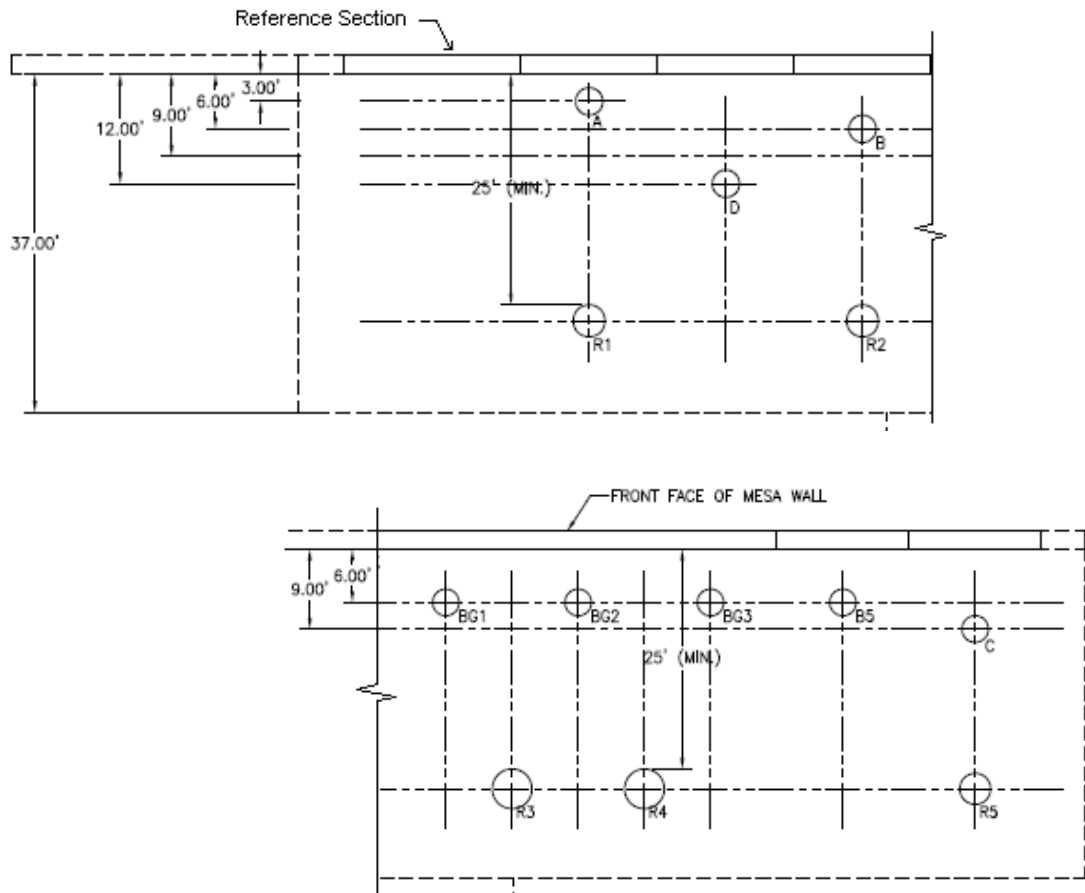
Plan view of MSE test wall and shafts (Tensar, 2007).
